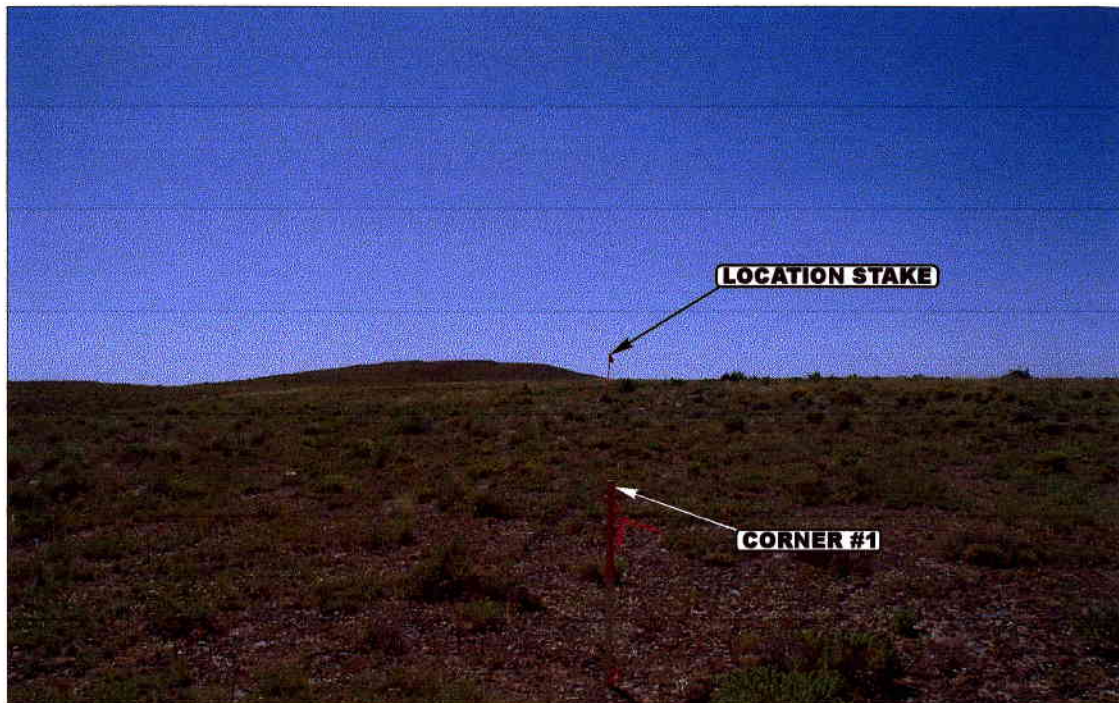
PHOTO: VIEW FROM CORNER #1 TO LOCATION STAKE
